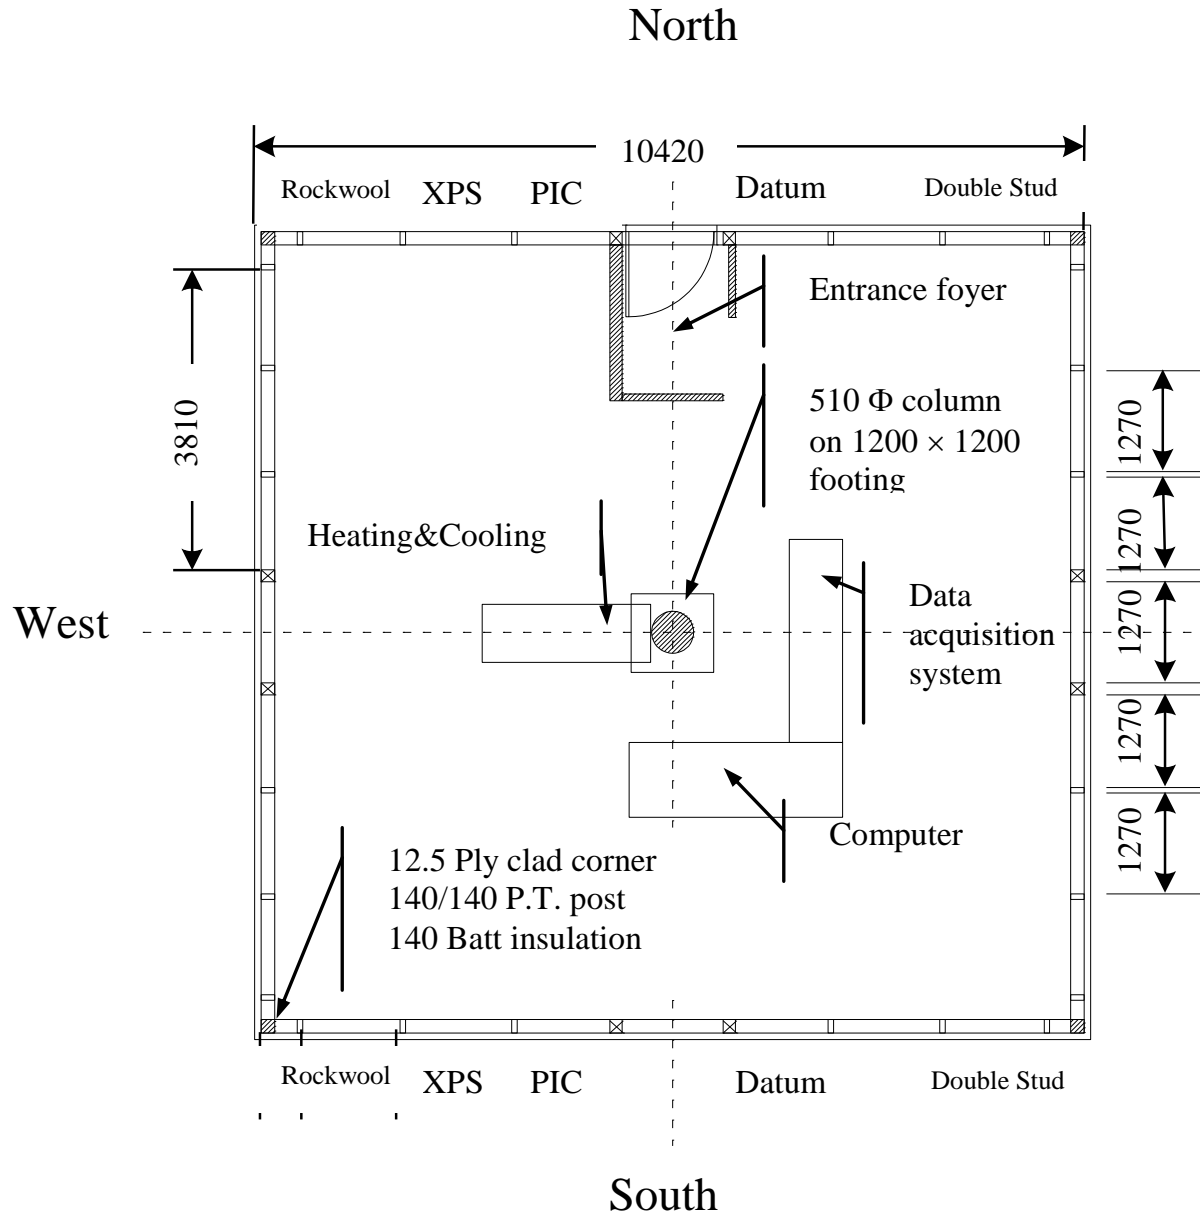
Construction plan of the BEGHUT and location of test walls (dimensions in mm)
